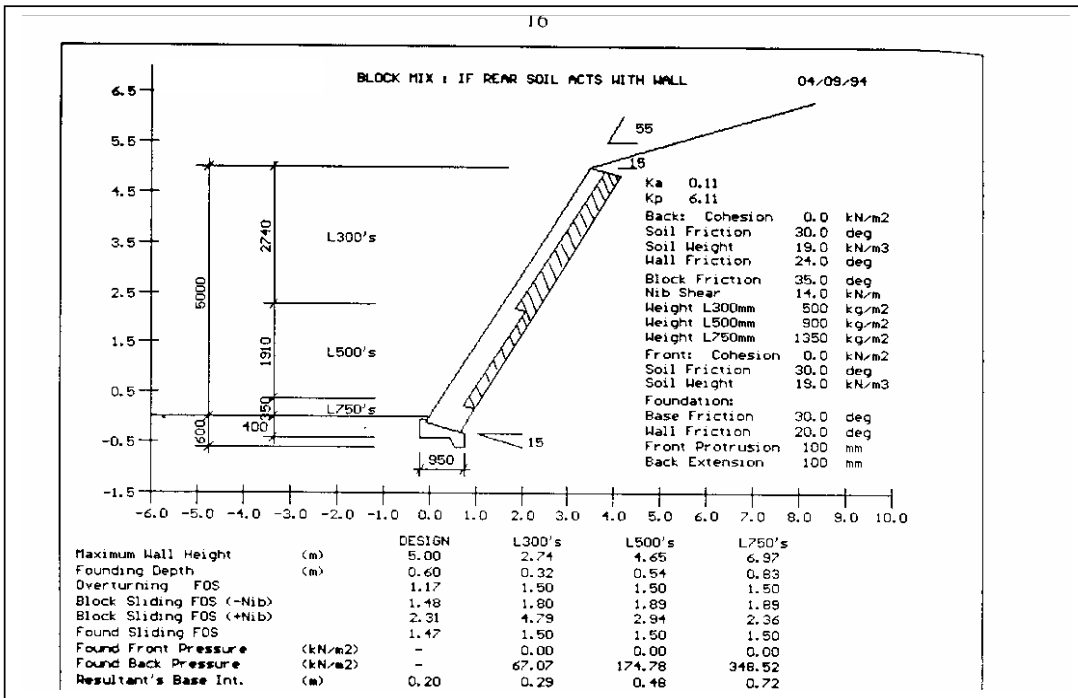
Diagrammatic illustration showing block of soil that in the past some designers have assumed would act together with the wall to resist sliding and overturning.
